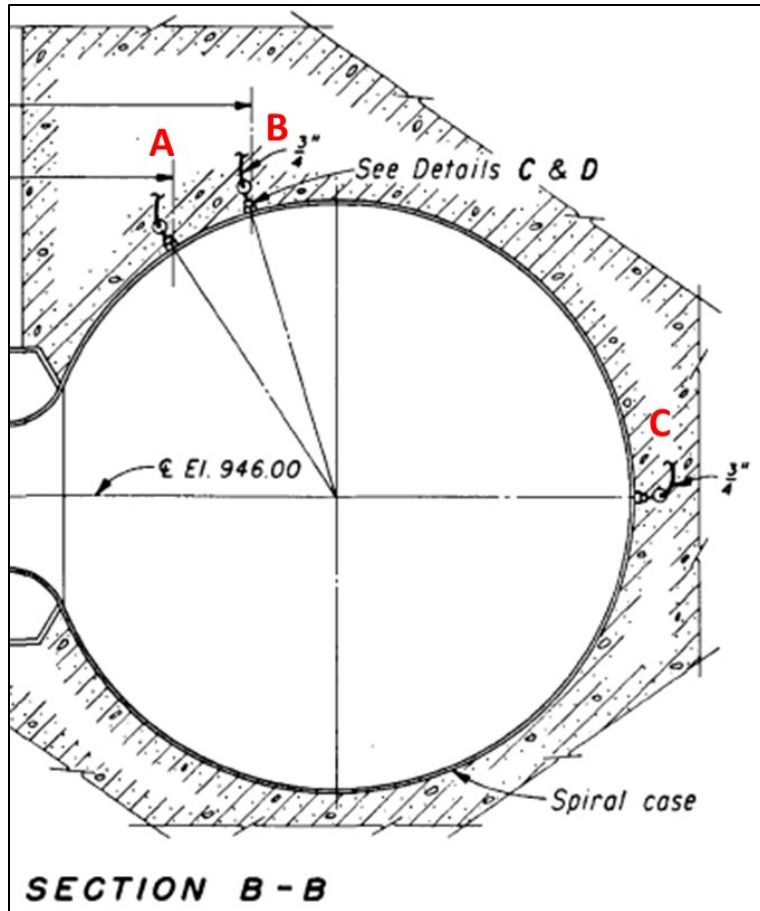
Cross section view of WK pressure taps for unit G20 from drawing 1222-D-940.
